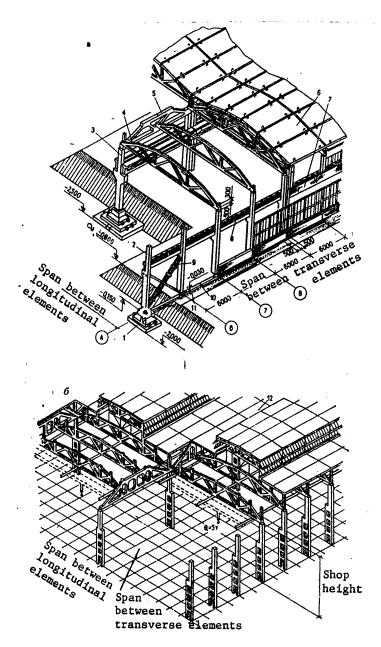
One-story, multibay frame industrial building built from prefabricated reinforced concrete. a--With supported cranes; b--with overhead-track hoists; 1--column foundations; 2--wall column; 3--middle column; 4--roof girder; 5--rafter truss; 6-12--roofing slabs; 7--wall panel; 8--crane girder; 9--vertical couplings; 10--foundation girder; 11--blind area.
